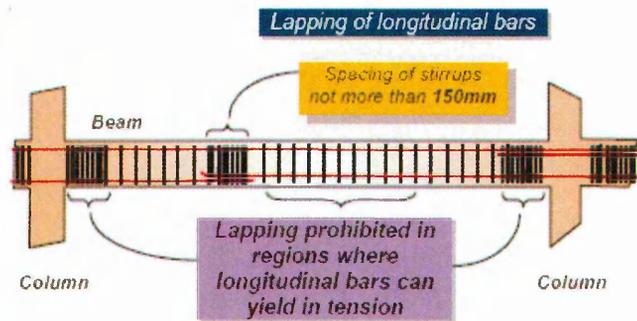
Details of lapping steel reinforcement in seismic beams (IITK-BMTPC, 2003)
